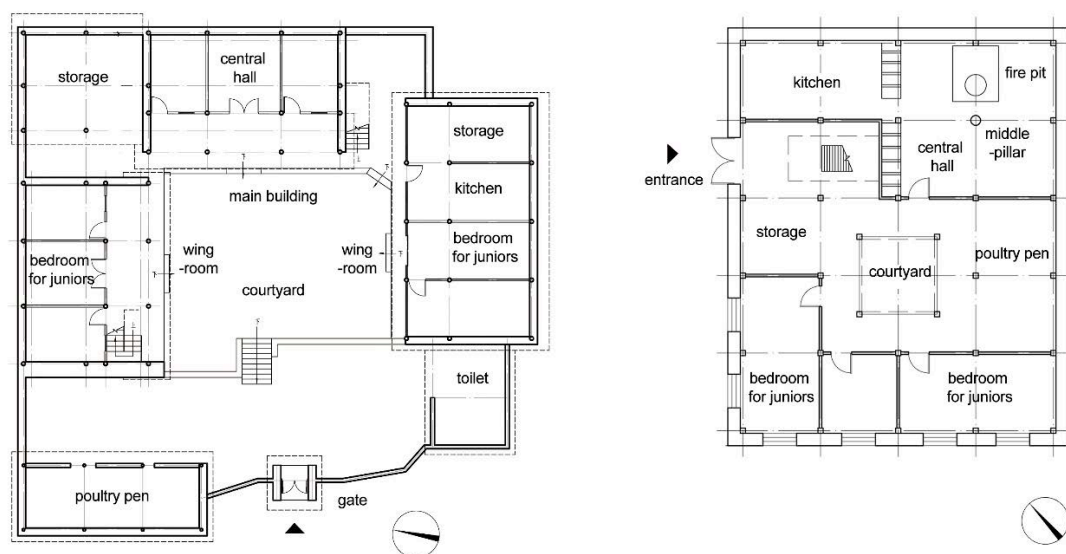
The Plans of Typical Traditional Rural Buildings (Left, a Dwelling of Bai in Yunnan; Right, a Tibetan Dwelling) Drawing by Author
